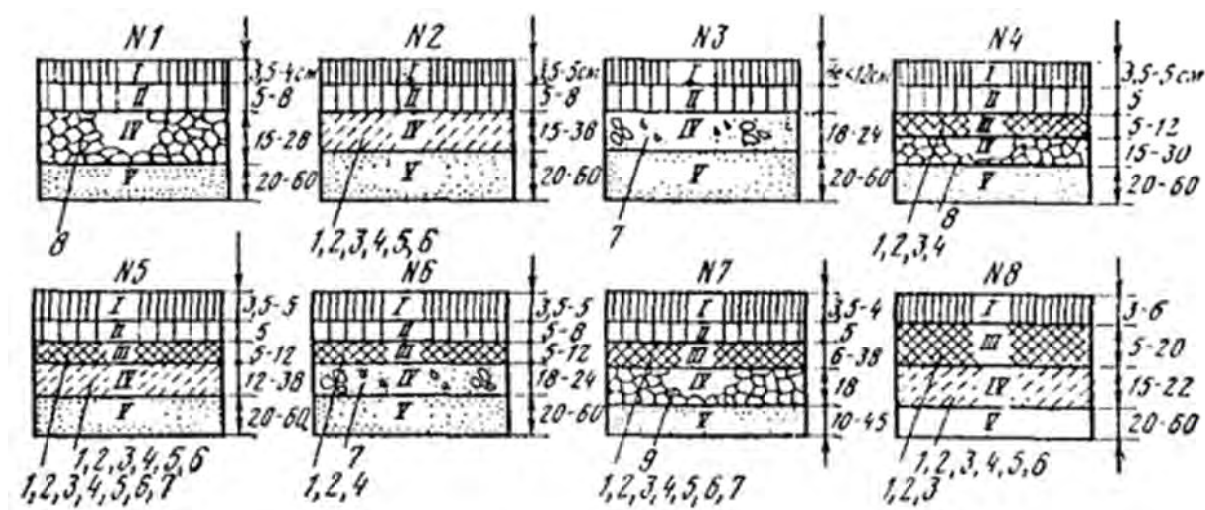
Examples of typical road structures with asphalt surfacing
